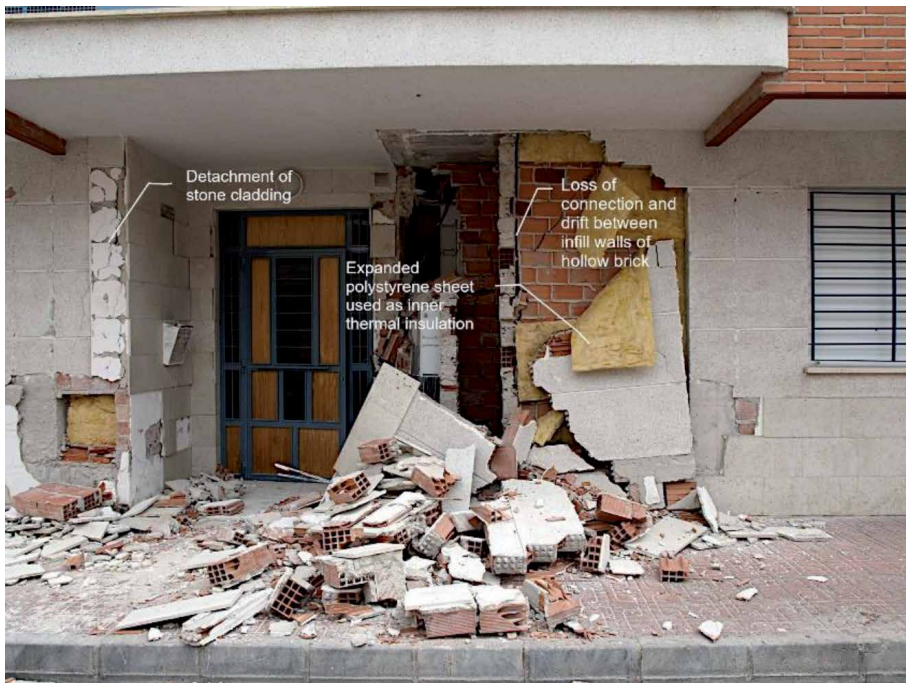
Lorca, shear cracks caused the detachment and loss of stone cladding and the toppling of the outer leaf of the brickwork wall (grade 3, class C). Source: IERD.
